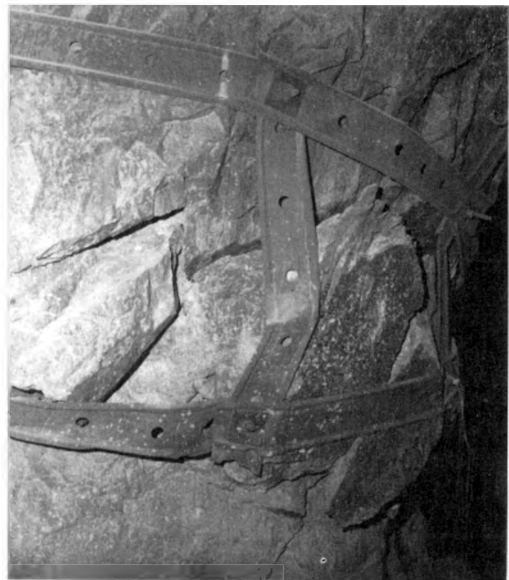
Cone bolts with W-strapping were installed in drawpoint walls in the S2 stope at 800 m depth. Here the wall remained in place despite a close seismic event. Elsewhere there was loss of ground around bolt collars.
